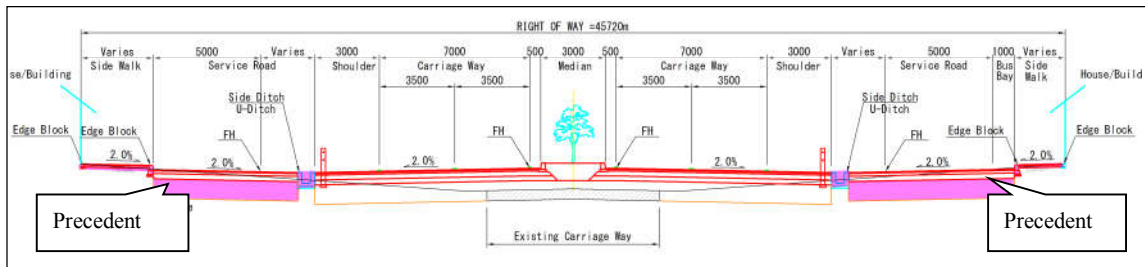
Secure of existing traffic in case of constructing service roads
